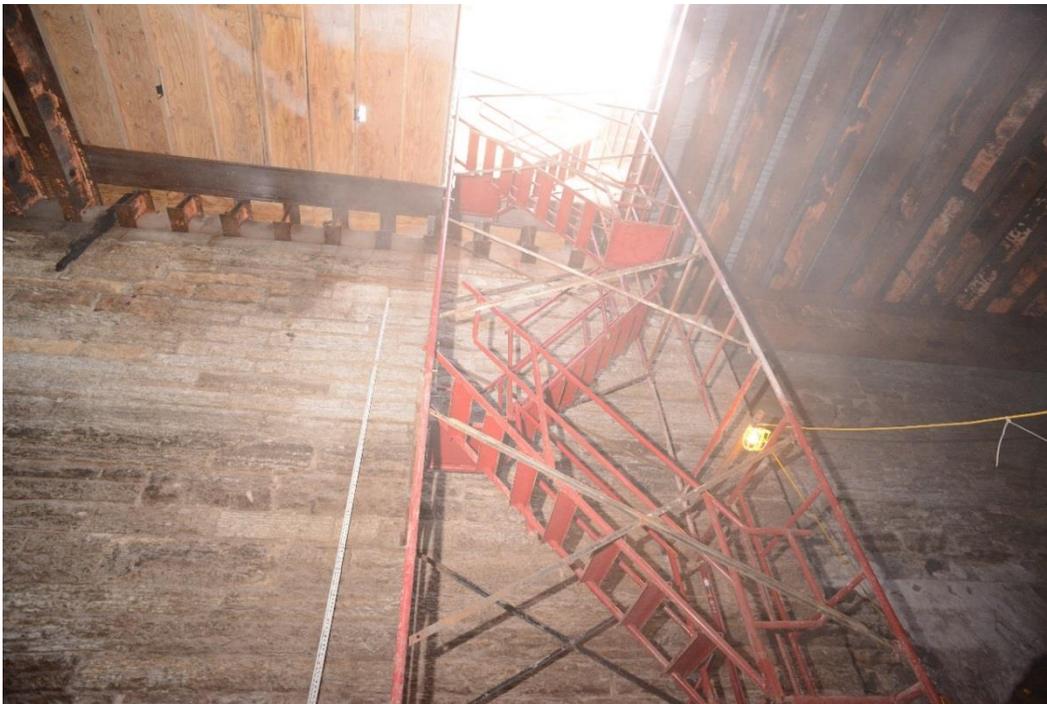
Access stairs and opening. Photograph by CNA Engineers, Inc., January 2014.
